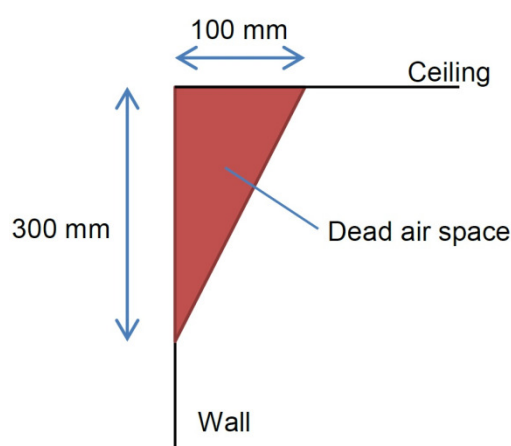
Smoke alarms should not be placed within 'dead air' space near the junction of a ceiling and wall.
